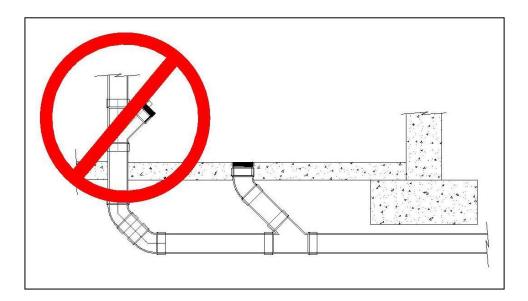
System will NOT protect plumbing fixtures located below that point (e.g.: floor drain, shower drain, toilet, etc.).
